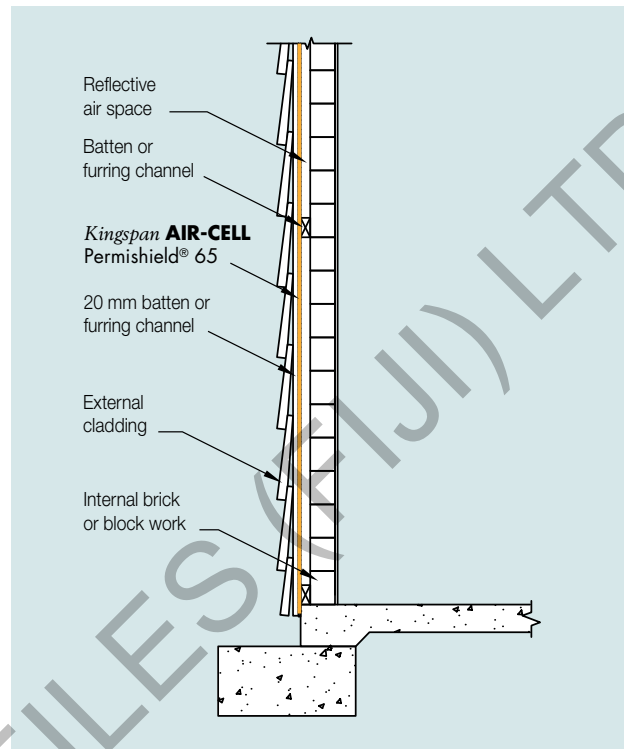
Side elevation of Kingspan AIR-CELL Permishield® 65 in a reverse brick veneer wall
